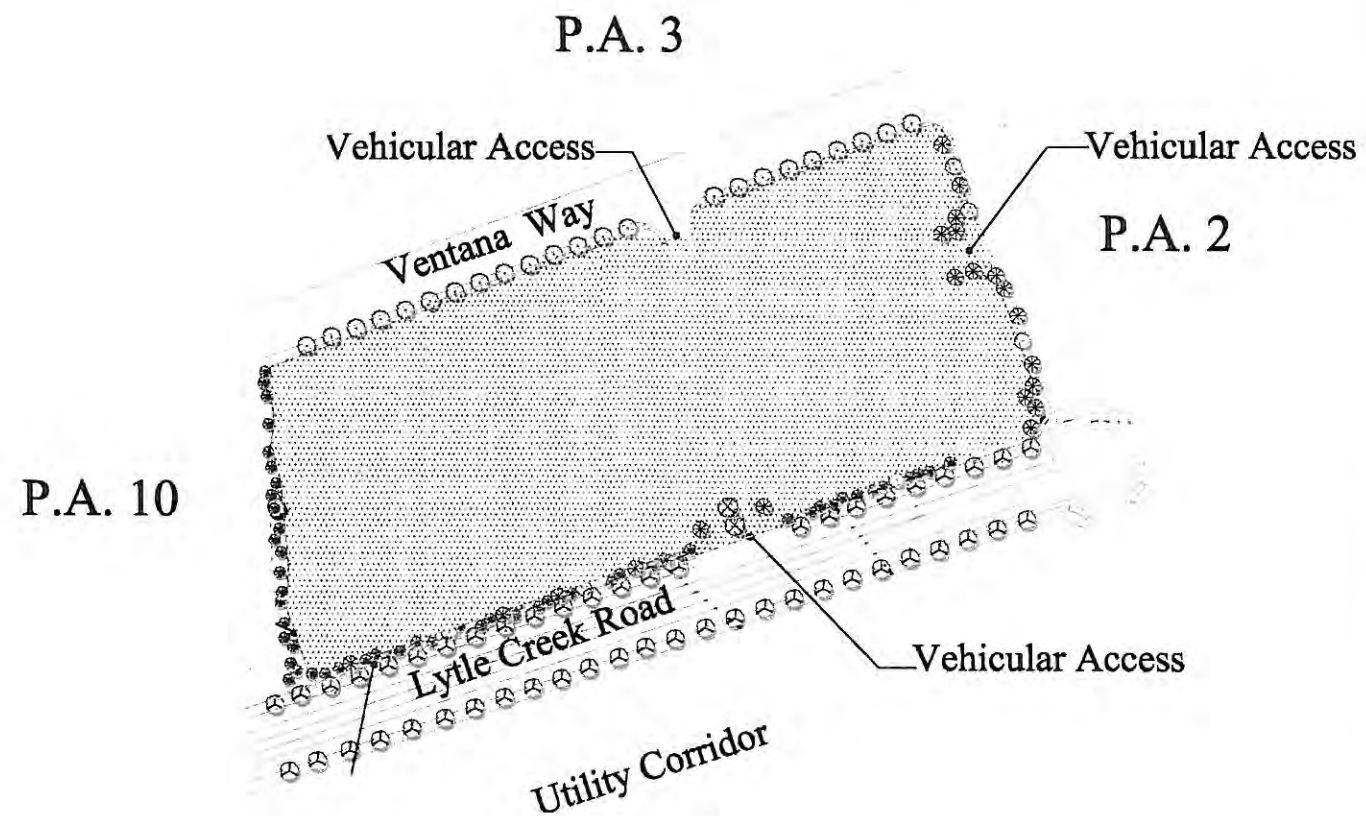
provides general planning criteria for this planning area, including vehicular access, walls and landscape features. Figure 25 provides architectural design standard for this "Corporate Corridor" Planning Area, and for Planning Areas 3, and 4, to the north.
